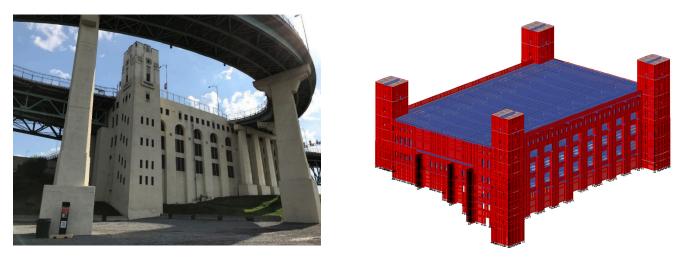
Pavilion (a) Photo and (b) 3D model.
